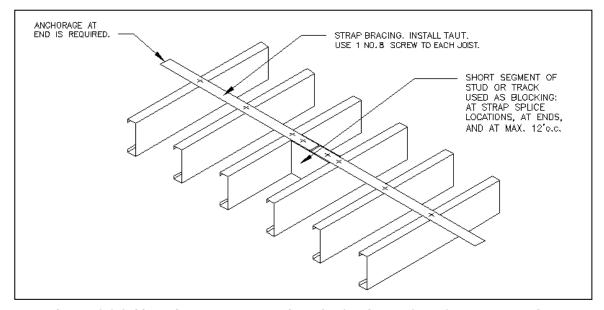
Ceiling Joist Top Flange Bracing With Continuous Steel Strap and Blocking
